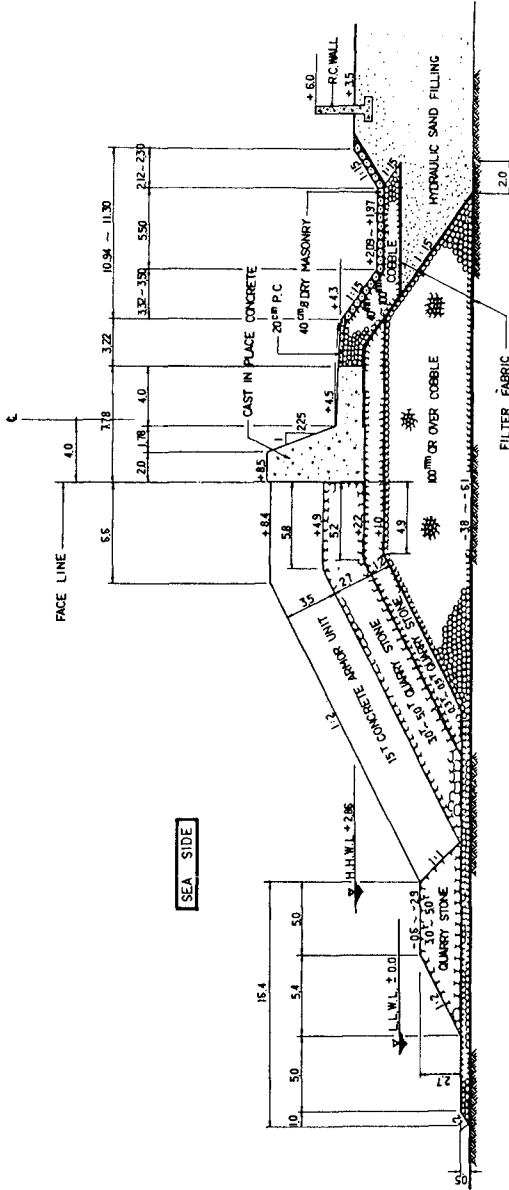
Typical Cross Section of Seawall (rubble mound)
